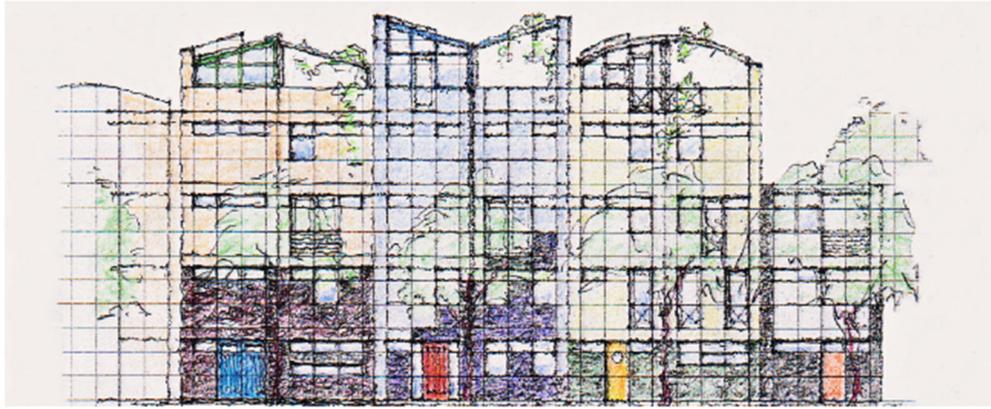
Three larger houses sharing plan solution plus the smallest one.
